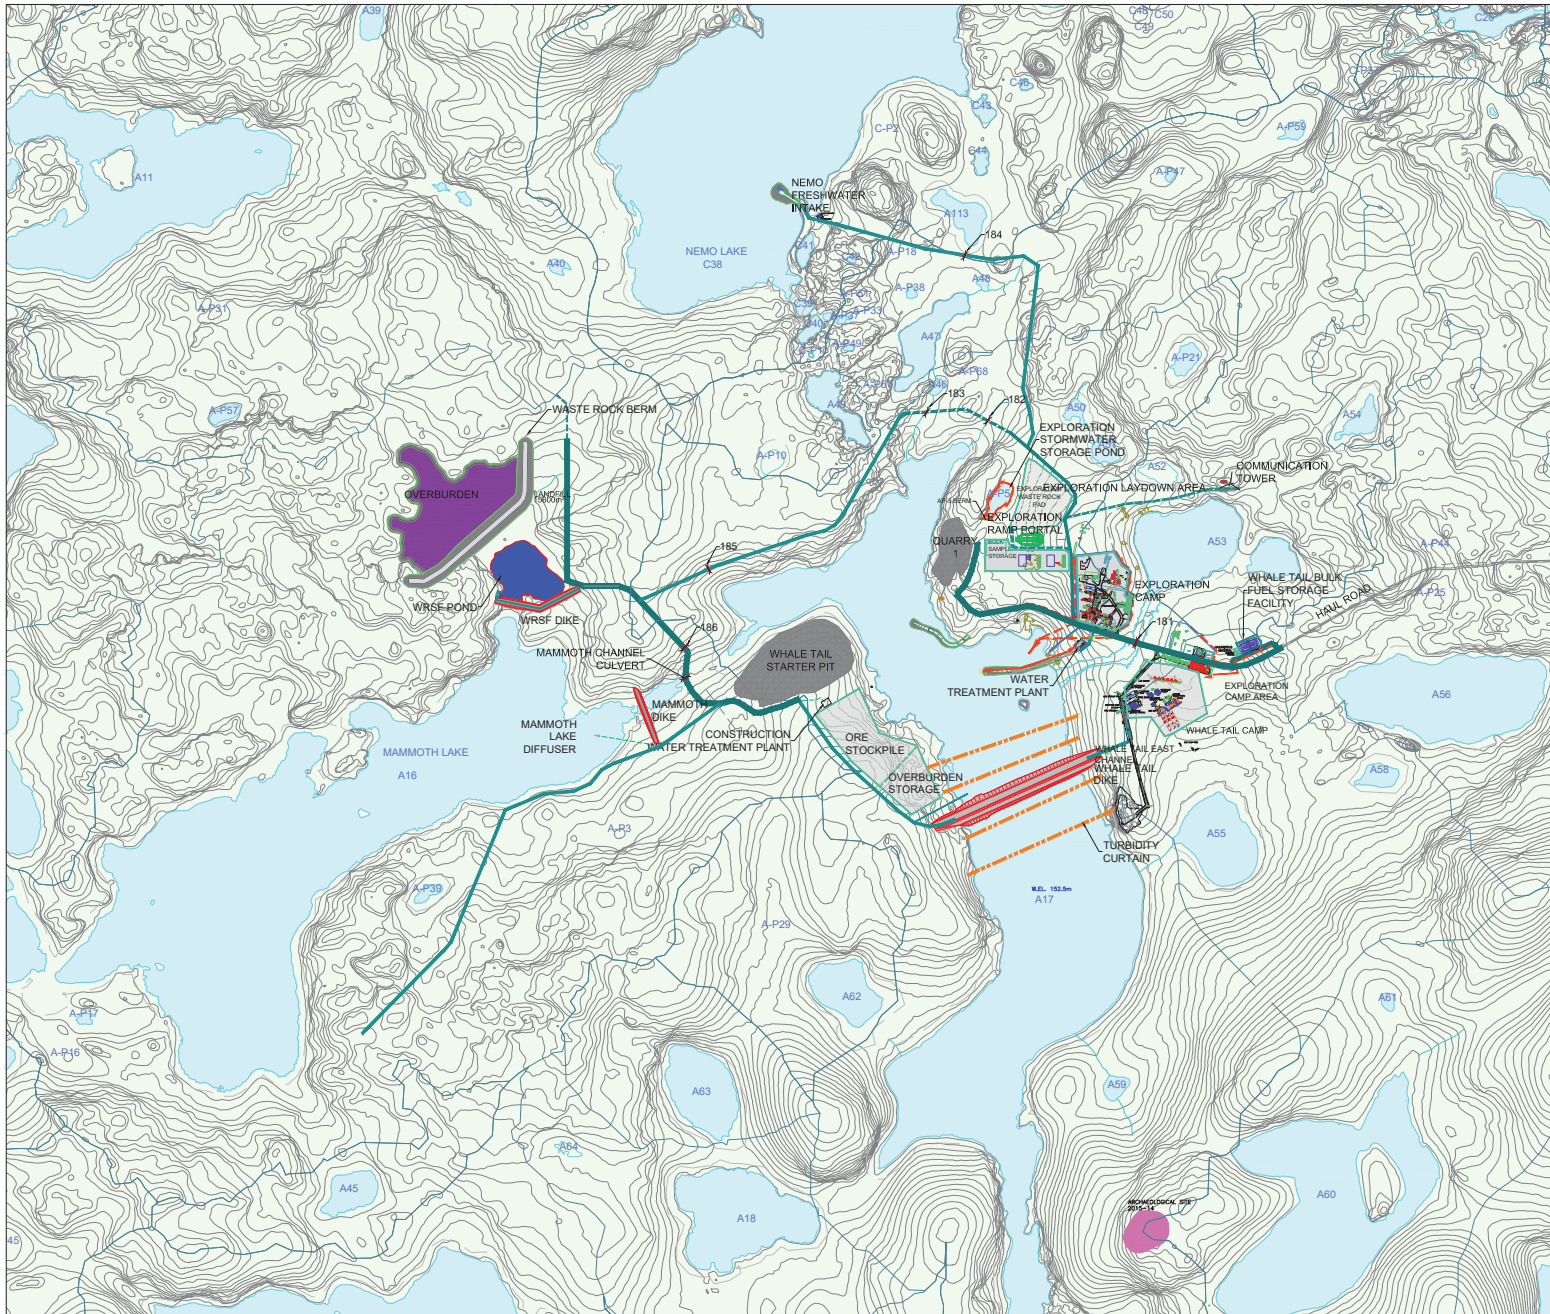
Yearly Site Layout Plan (Year -1: 2018)
